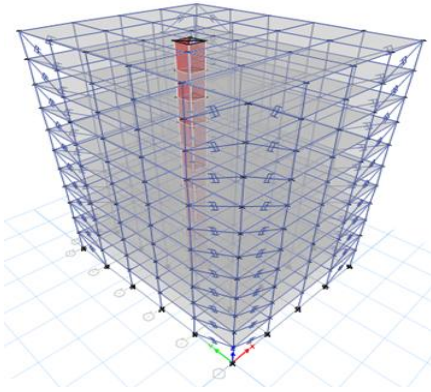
RCC building with corner Fluid Viscous Dampers 3D view.
